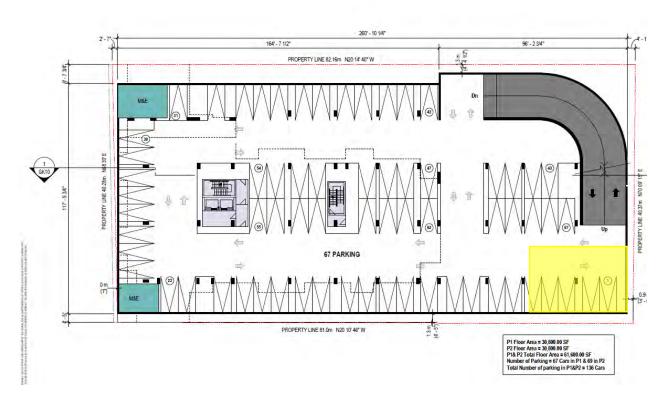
Floor plan of proposed underground parking garage for new building; yellow box indicates the area of the underground parking garage that is within four metres of the coach house associated with 507 Queen Avenue (Source: Zedd Architecture, 2020).
